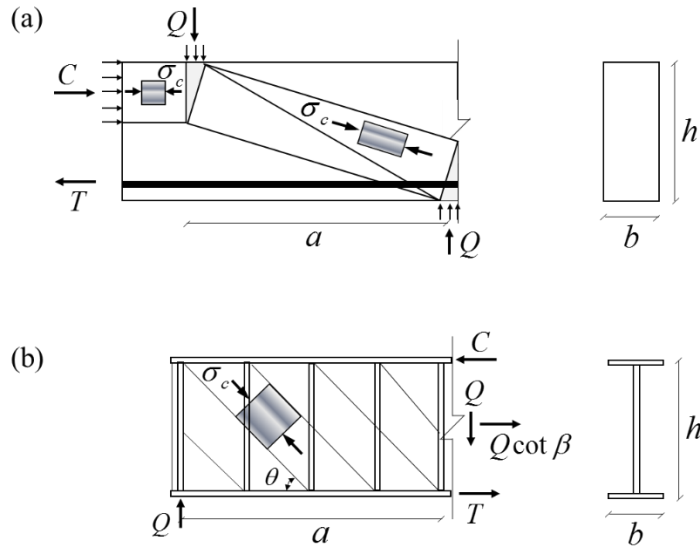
Beam loaded in shear by concentrated forces; (a) arch action for a beam without stirrups, (b) truss action for a beam with stirrups
